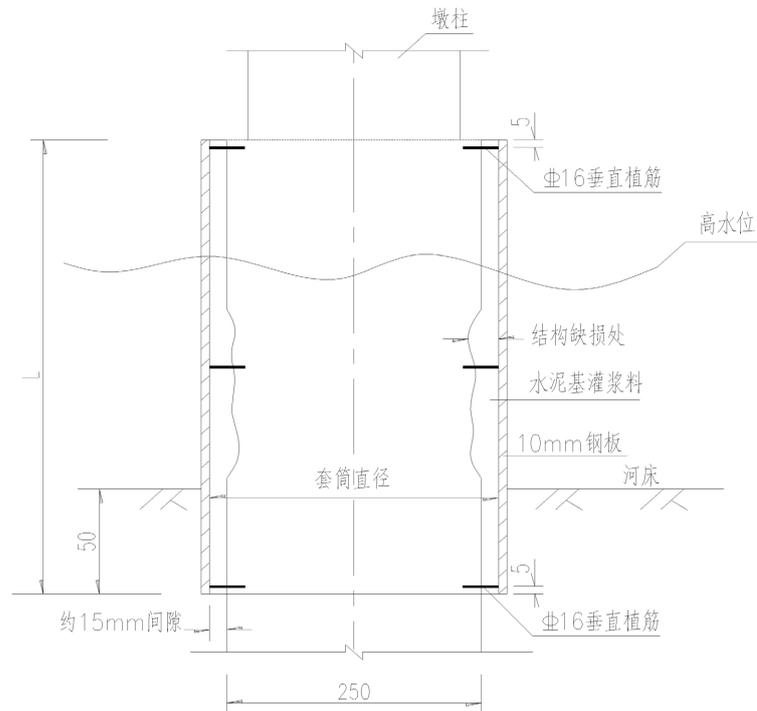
Diagram of pile foundation reinforcement scheme with steel sleeve
